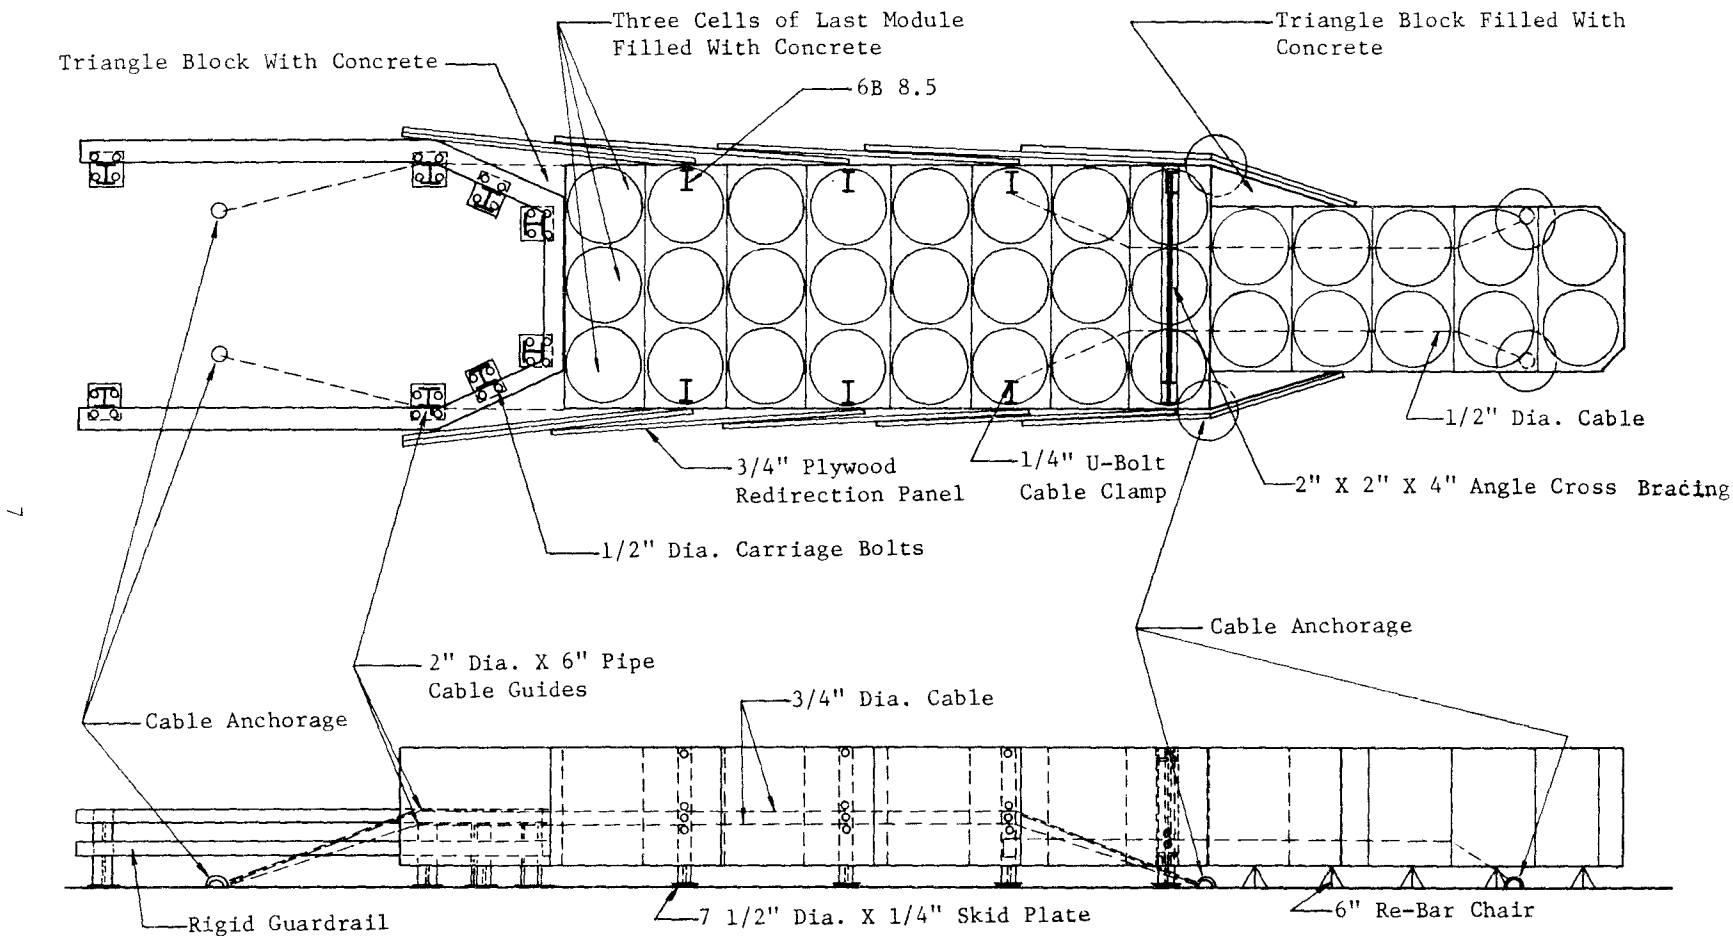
, Details of Concrete Crash Cushion (505V-D, -E, and -F) (Mod III).
